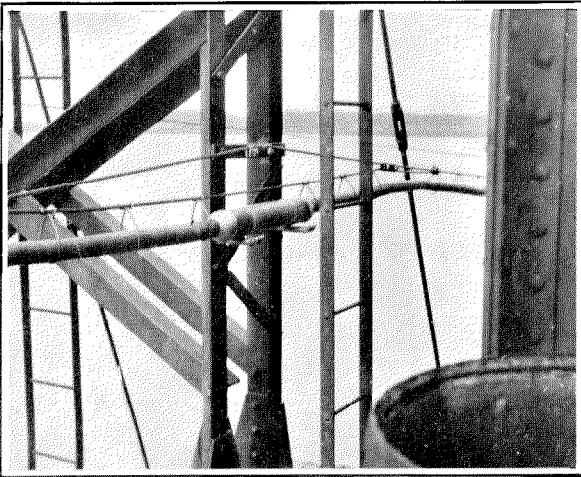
Cable Splice Resting on Brackets with the Cable Supported by an Auxiliary Strand
